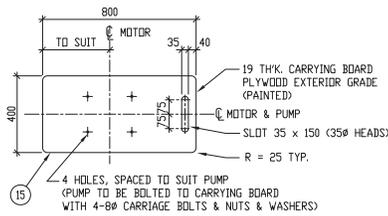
DIKE DRAIN PUMP ASSEMBLY INSTALLATION
